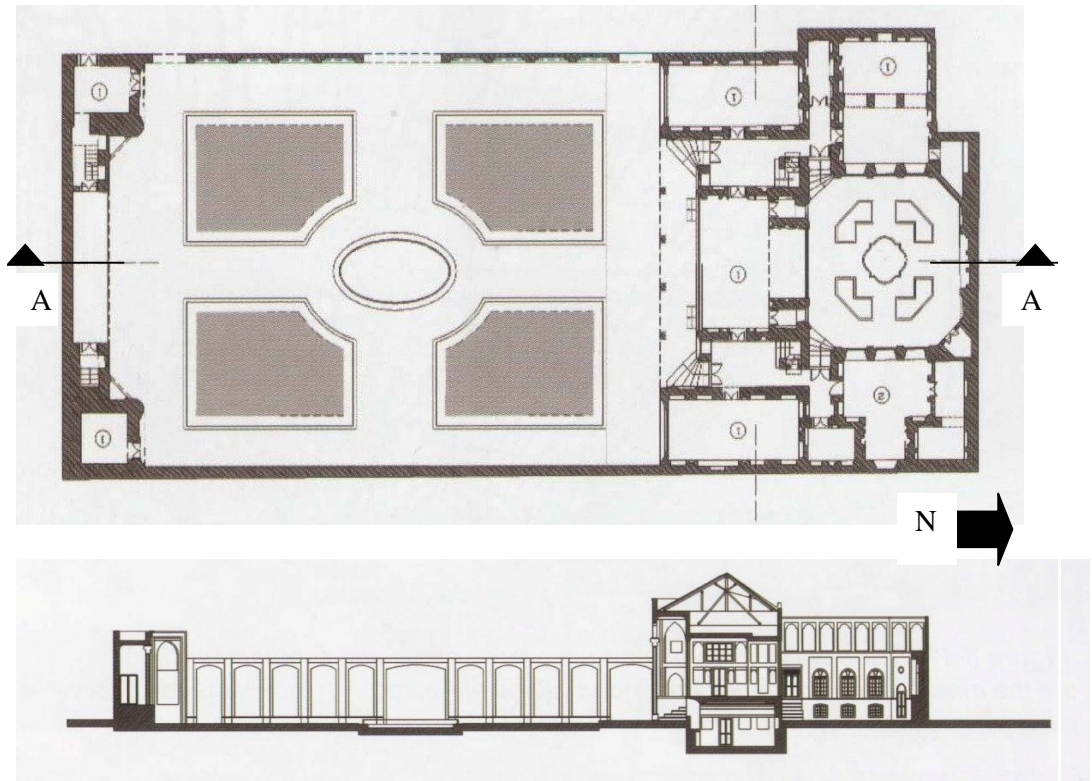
First floor plan and section A-A of Behnam House (Kleiss.W, 1995)
